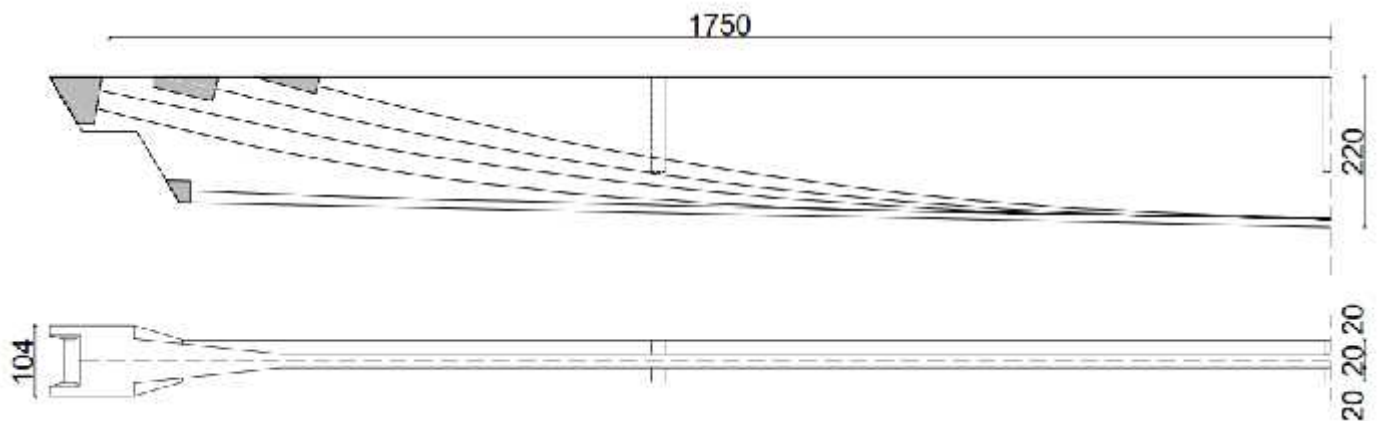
Prestressed wires in the internal longitudinal beam/ Cavi di precompressione nella trave longitudinale interna
